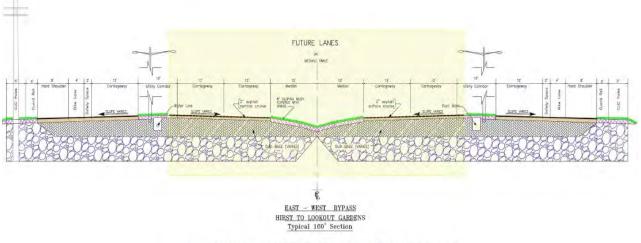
Proposed Cross-Section of East-West Arterial Road Extension
